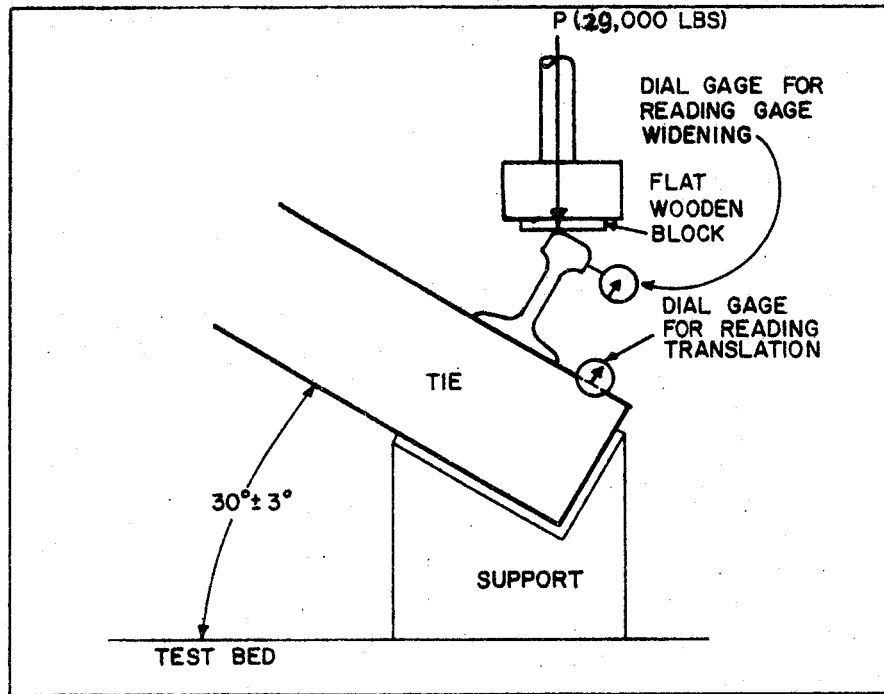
LATERAL LOAD RESTRAINT TEST
